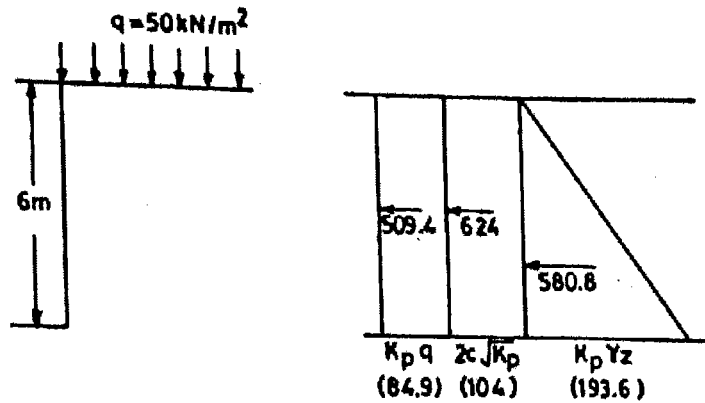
Retaining wall and earth pressure diagram—Example 12.7
